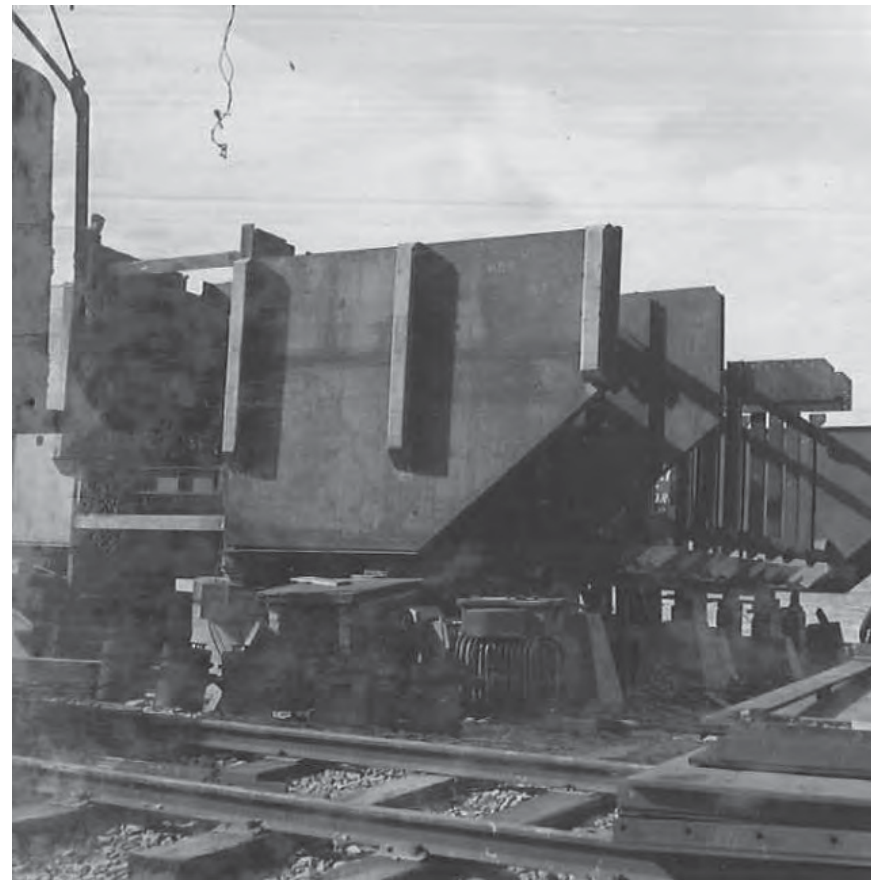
Close-up detail of the bulkhead sections of the prow resting on concrete blocks
